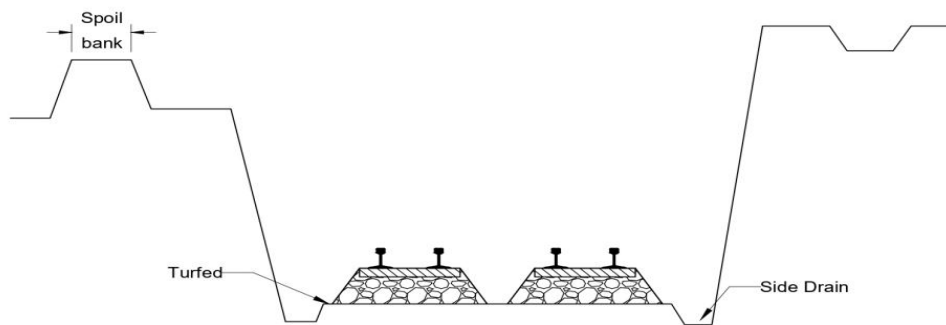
Typical cross section of a double line broad gauge track in cutting (on straight track)
